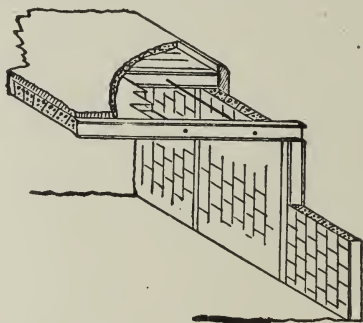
Sidewalk Vault Walls with I-Beam Columns and Flat Arches.
